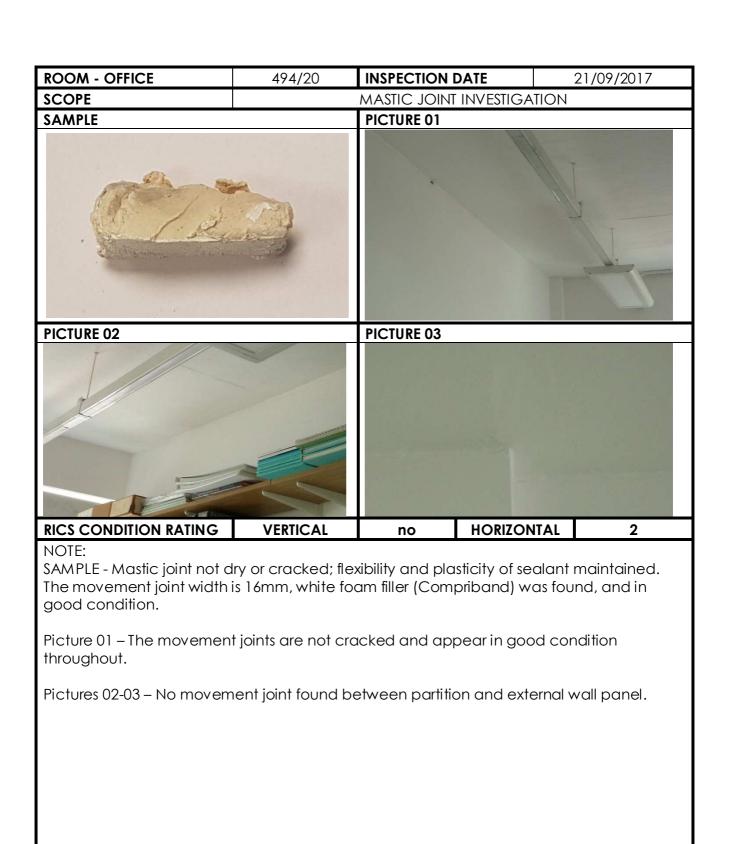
The movement joints are not cracked and appear in good condition throughout.
